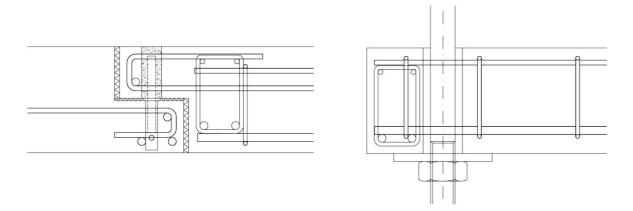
+12: Level free connections of SL-deck + Hung connections of SL-deck, Ill. Jakob E. Christensen.
